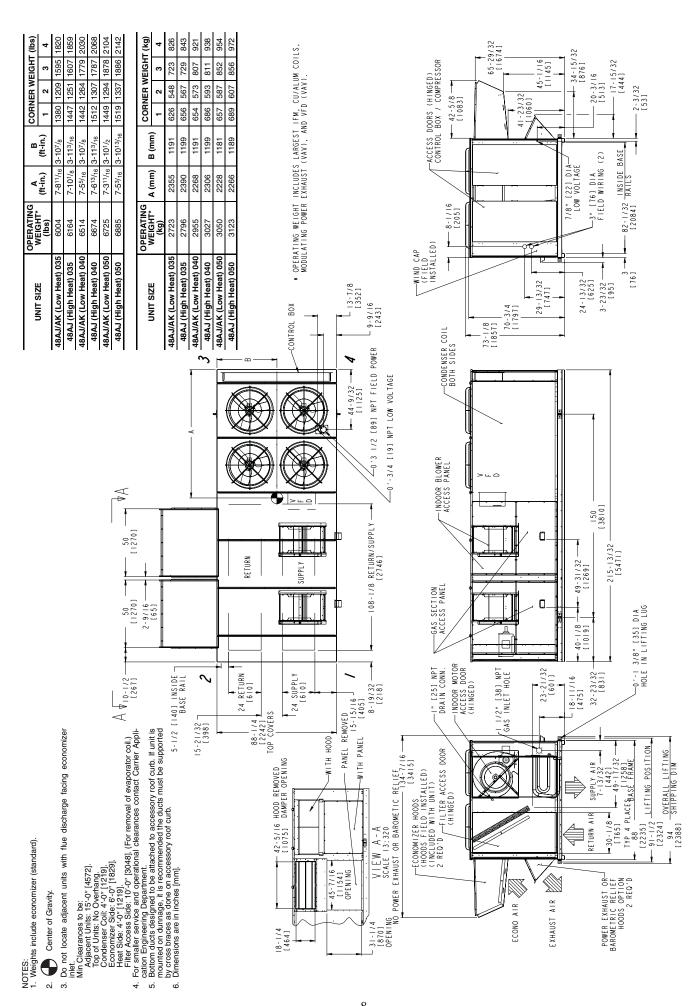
Base Unit Dimensions — 48AJ, AK035-050
